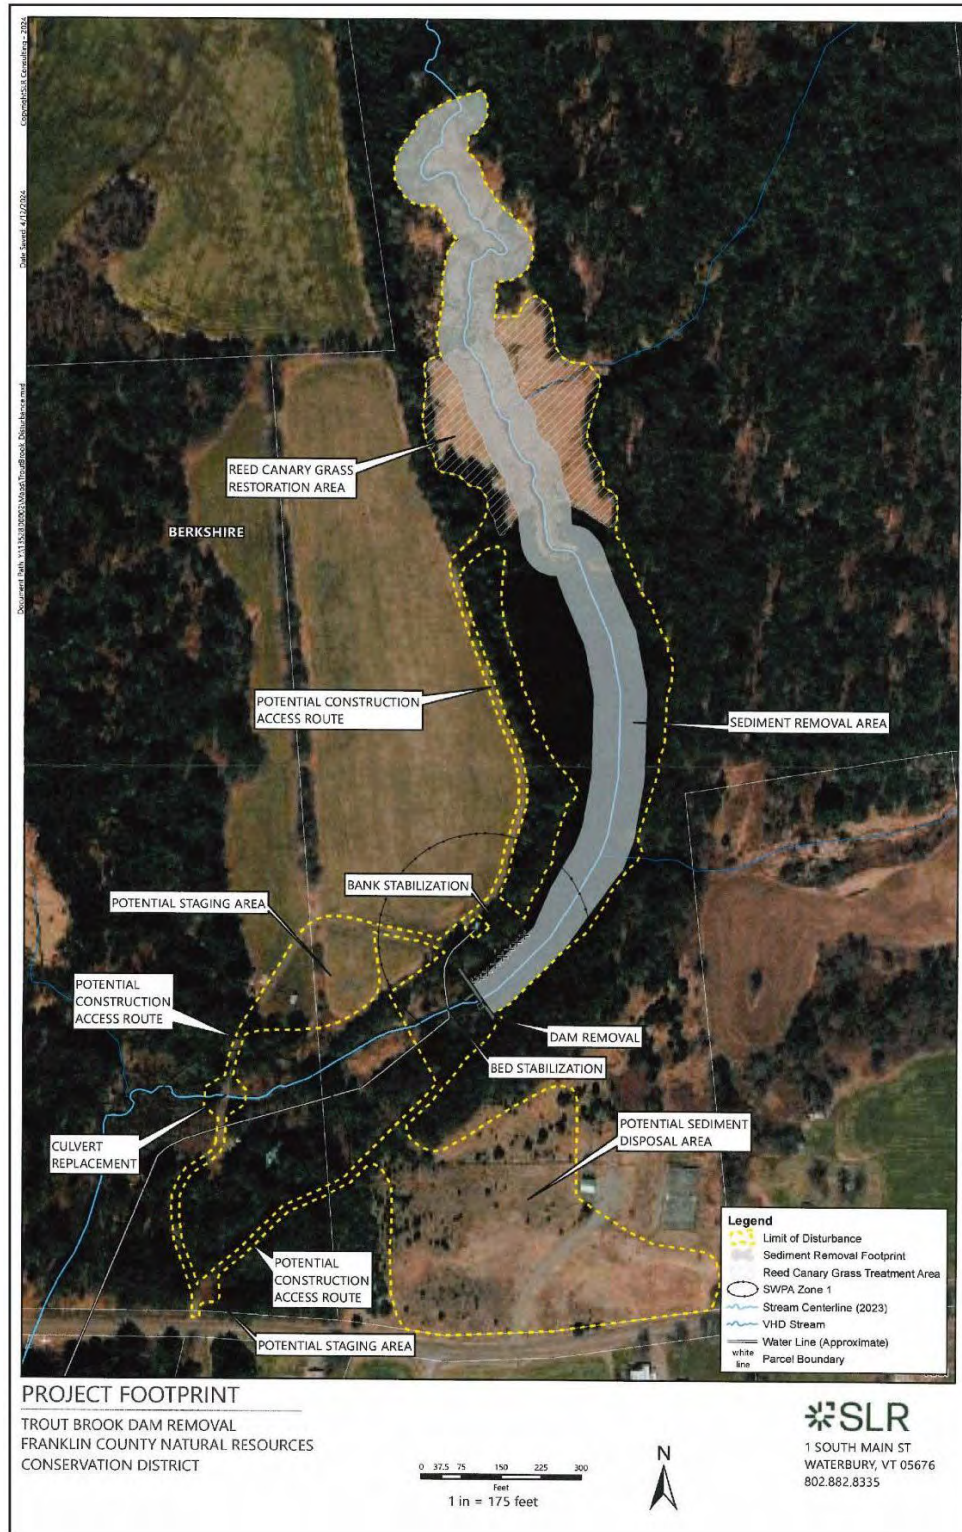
Trout Brook Dam Removal Project plans (provided by SLR).
